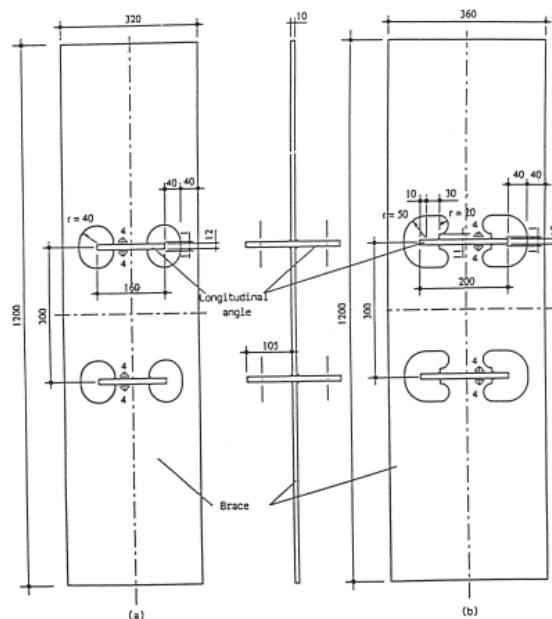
Small ICOM specimens tested by Frýba [68]: a) specimen with circular cut-outs; b) specimens with cut-outs with apple form.
